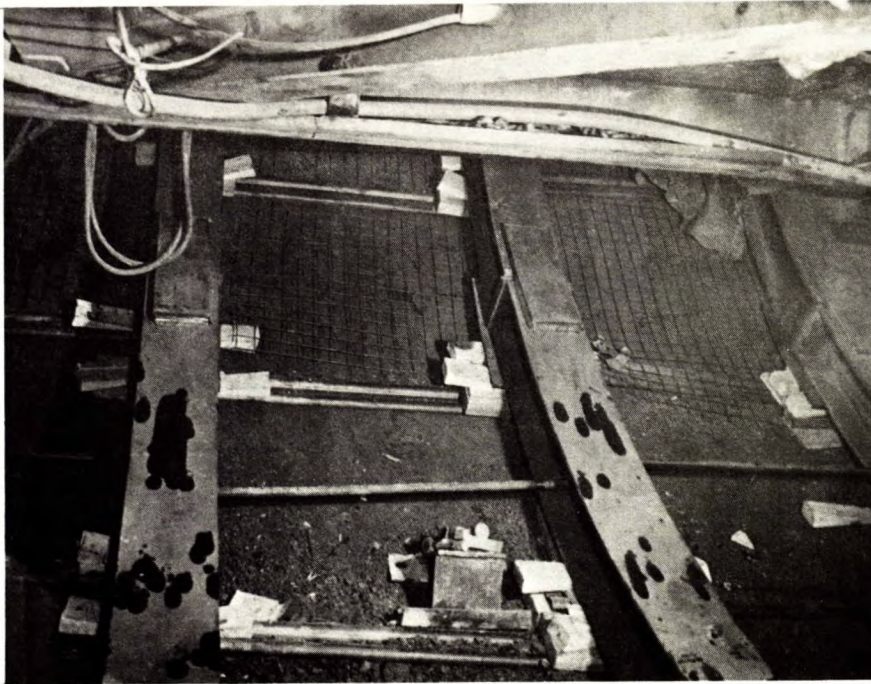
Wire mesh installed down to the haunch points in an invert section. Note the wide splice plates at the back of the ringbeams, and narrow plates on the inside.
